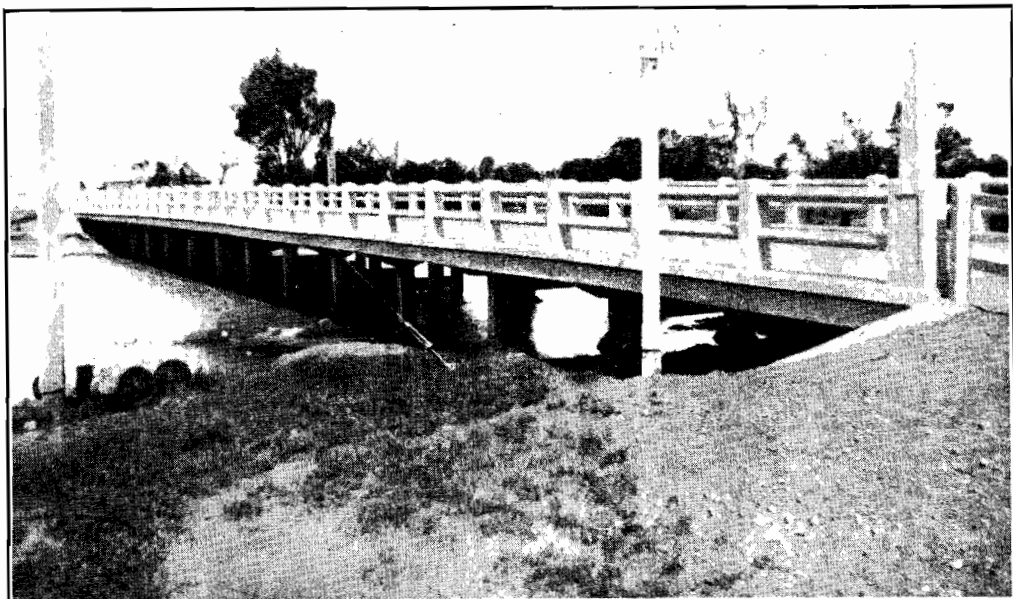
New bridge on Murray Valley Highway, west of Kerang.
